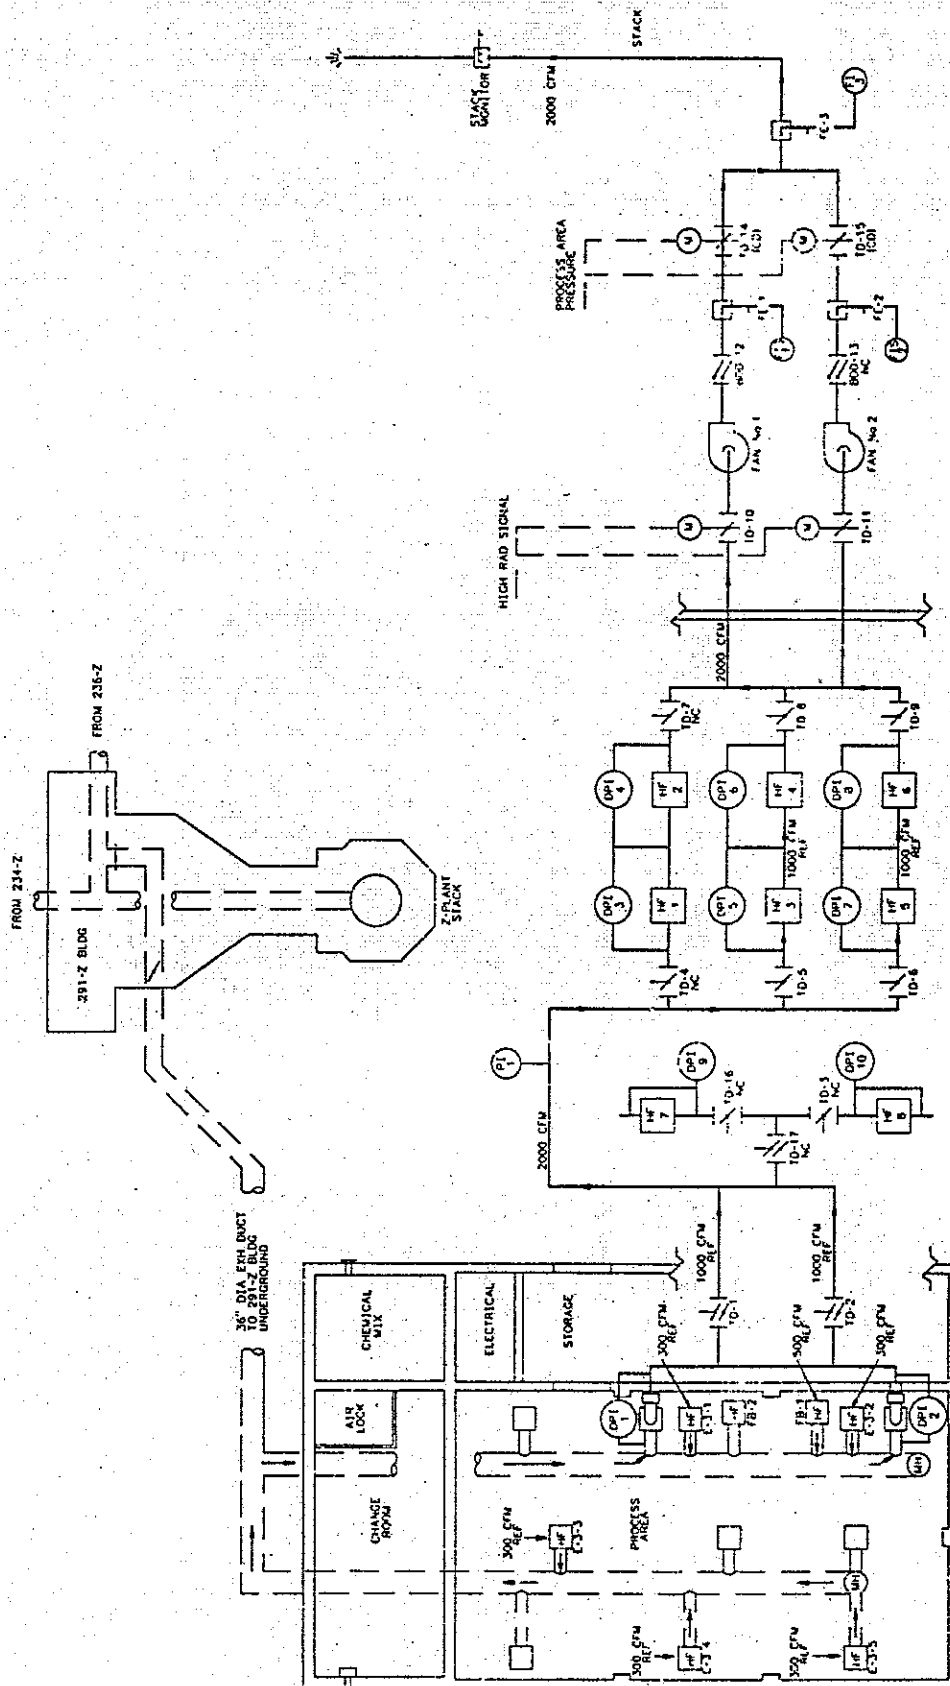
232-Z Ventilation System Showing Inactive Portion in 291-Z Building.
